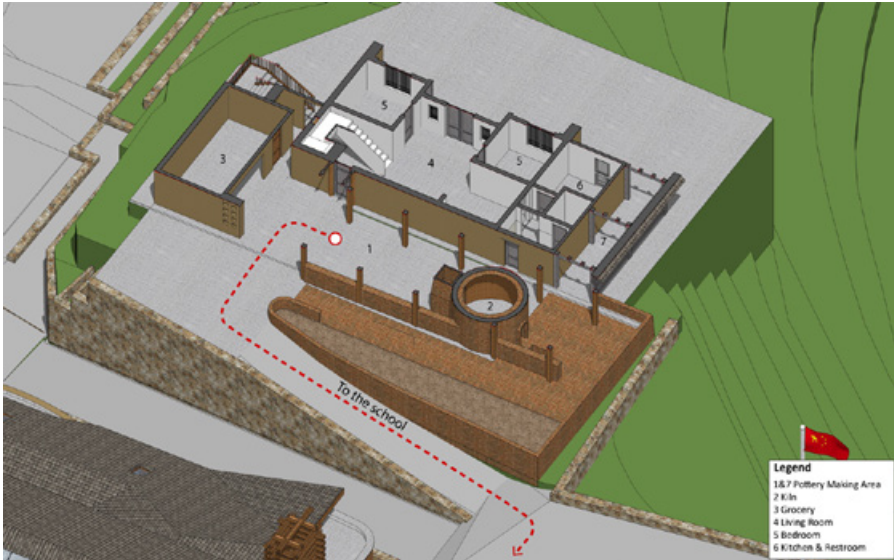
Strategically, the kiln was positioned along the building’s front facade to create a public open space between the private residence and the school building. (Source: Author)
